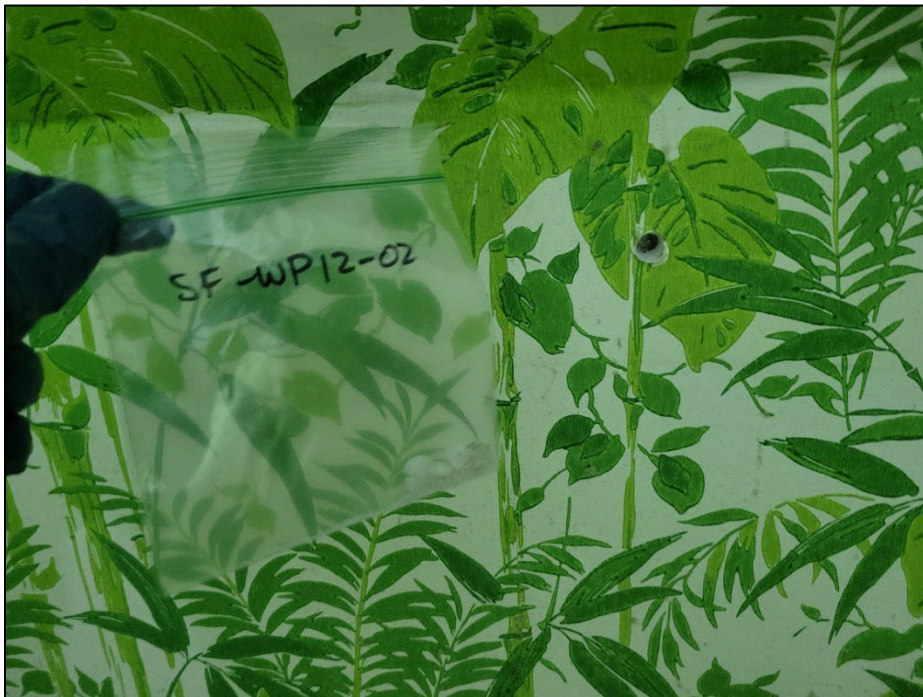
WP10: Multicolor wall paper and drywall first floor
